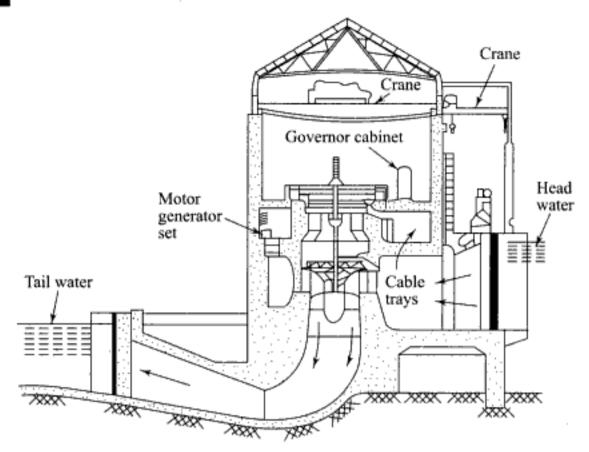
(c) Cross-section of typical low head concrete spiralcase setting with Kaplan turbine
